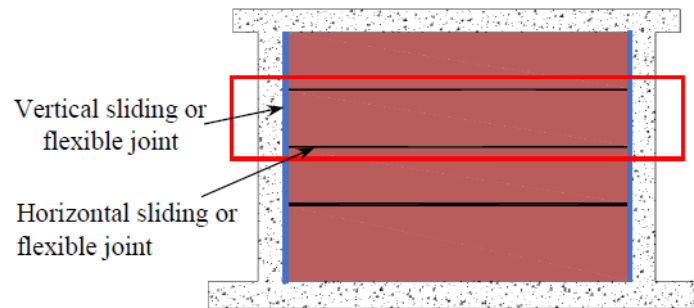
Reinforced concrete infill frame equipped with horizontal and vertical sliding/flexible joints.
